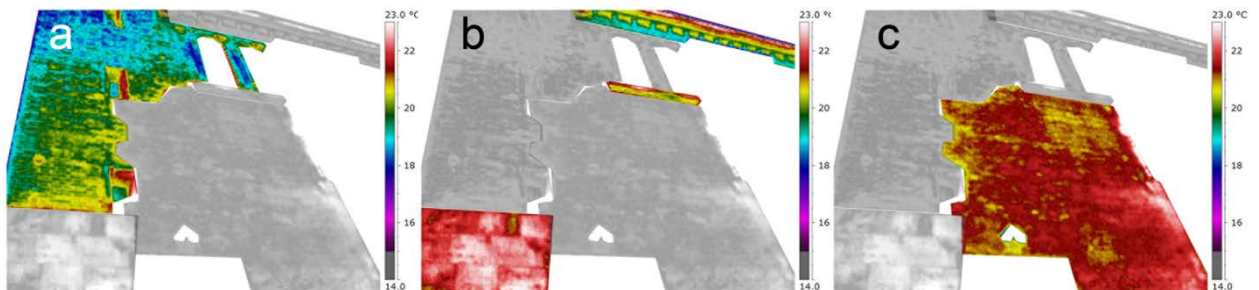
Materials analysis of the façade (a: brick, b: stone and c: rammed earth wall).
